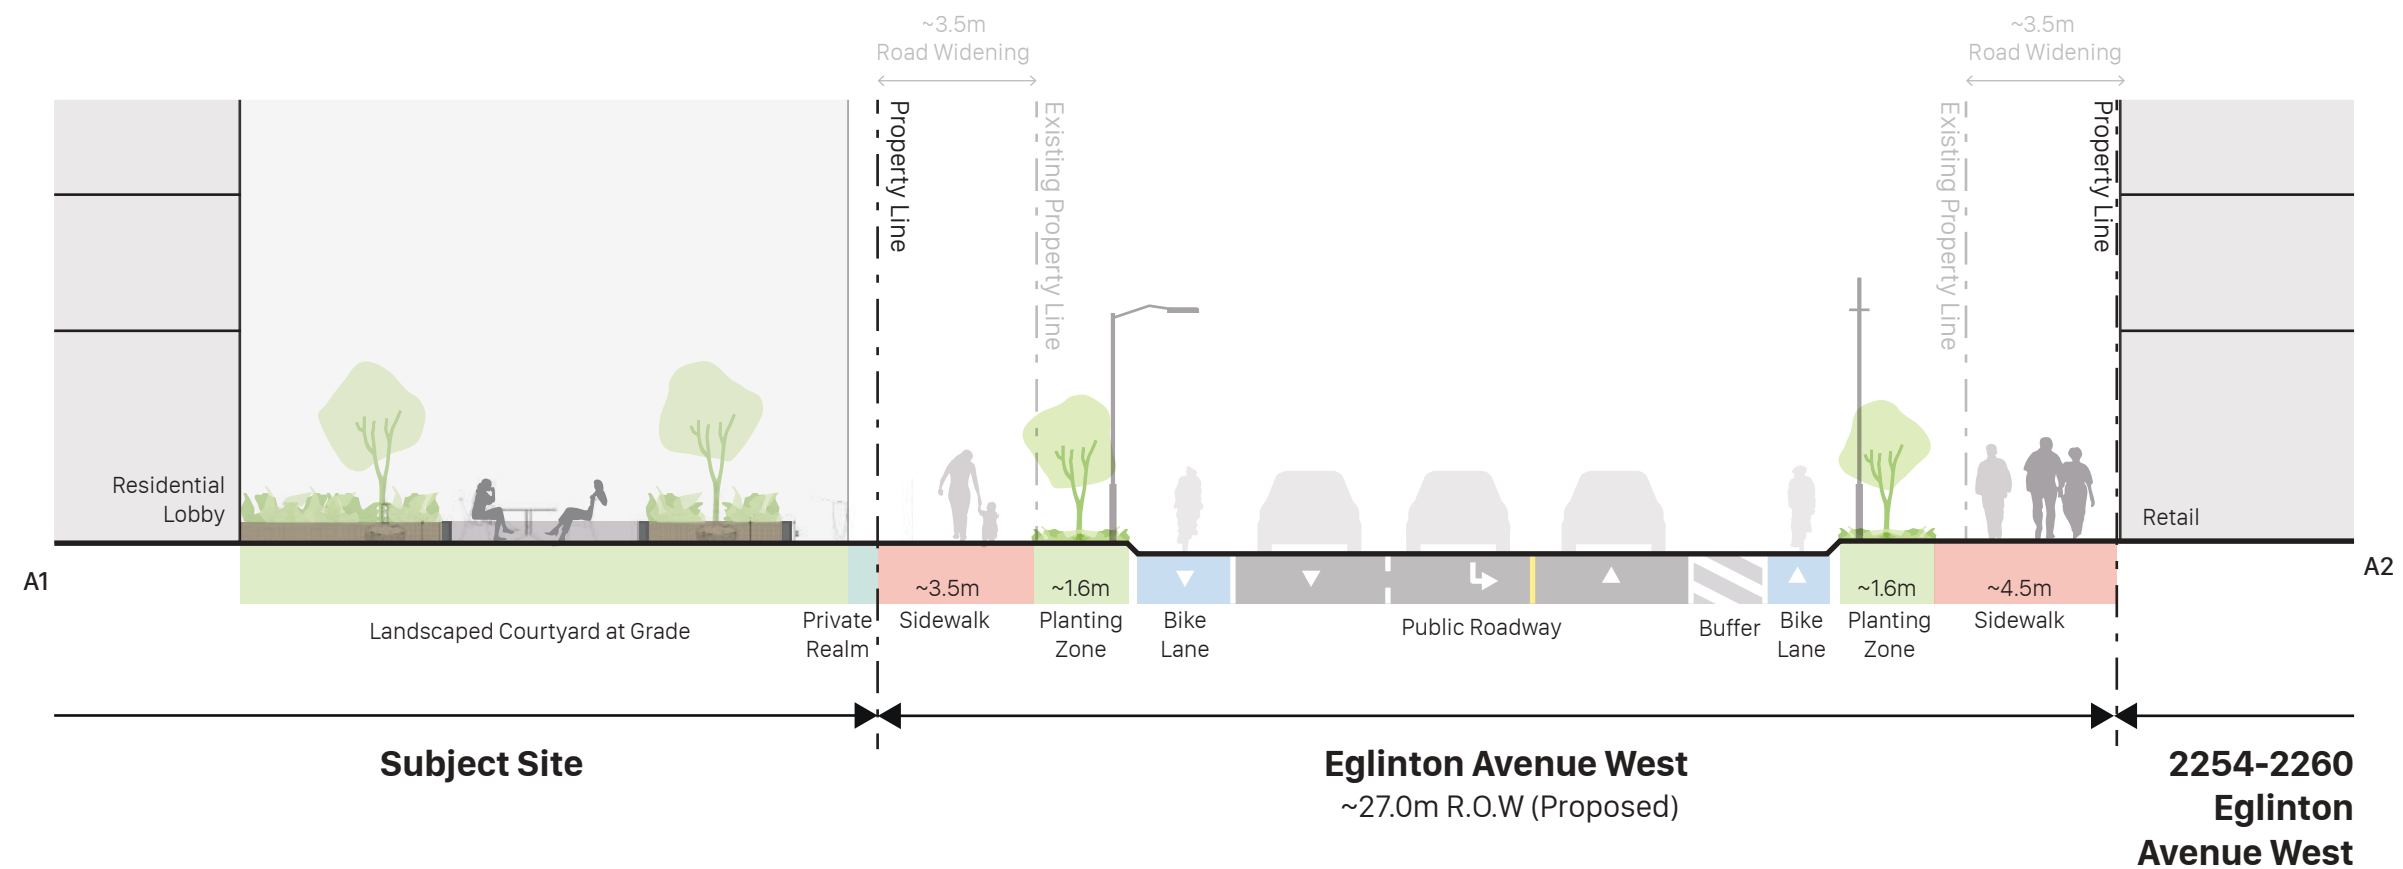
Section A1-A2 Eglinton Avenue West (Proposed)
